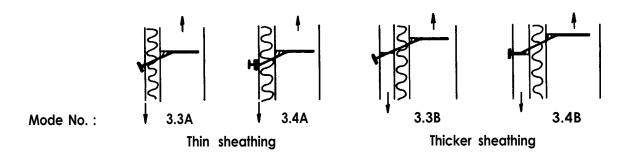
Failure modes for two-member joints with a layer of insulation between wood members. (ML85 5341)
